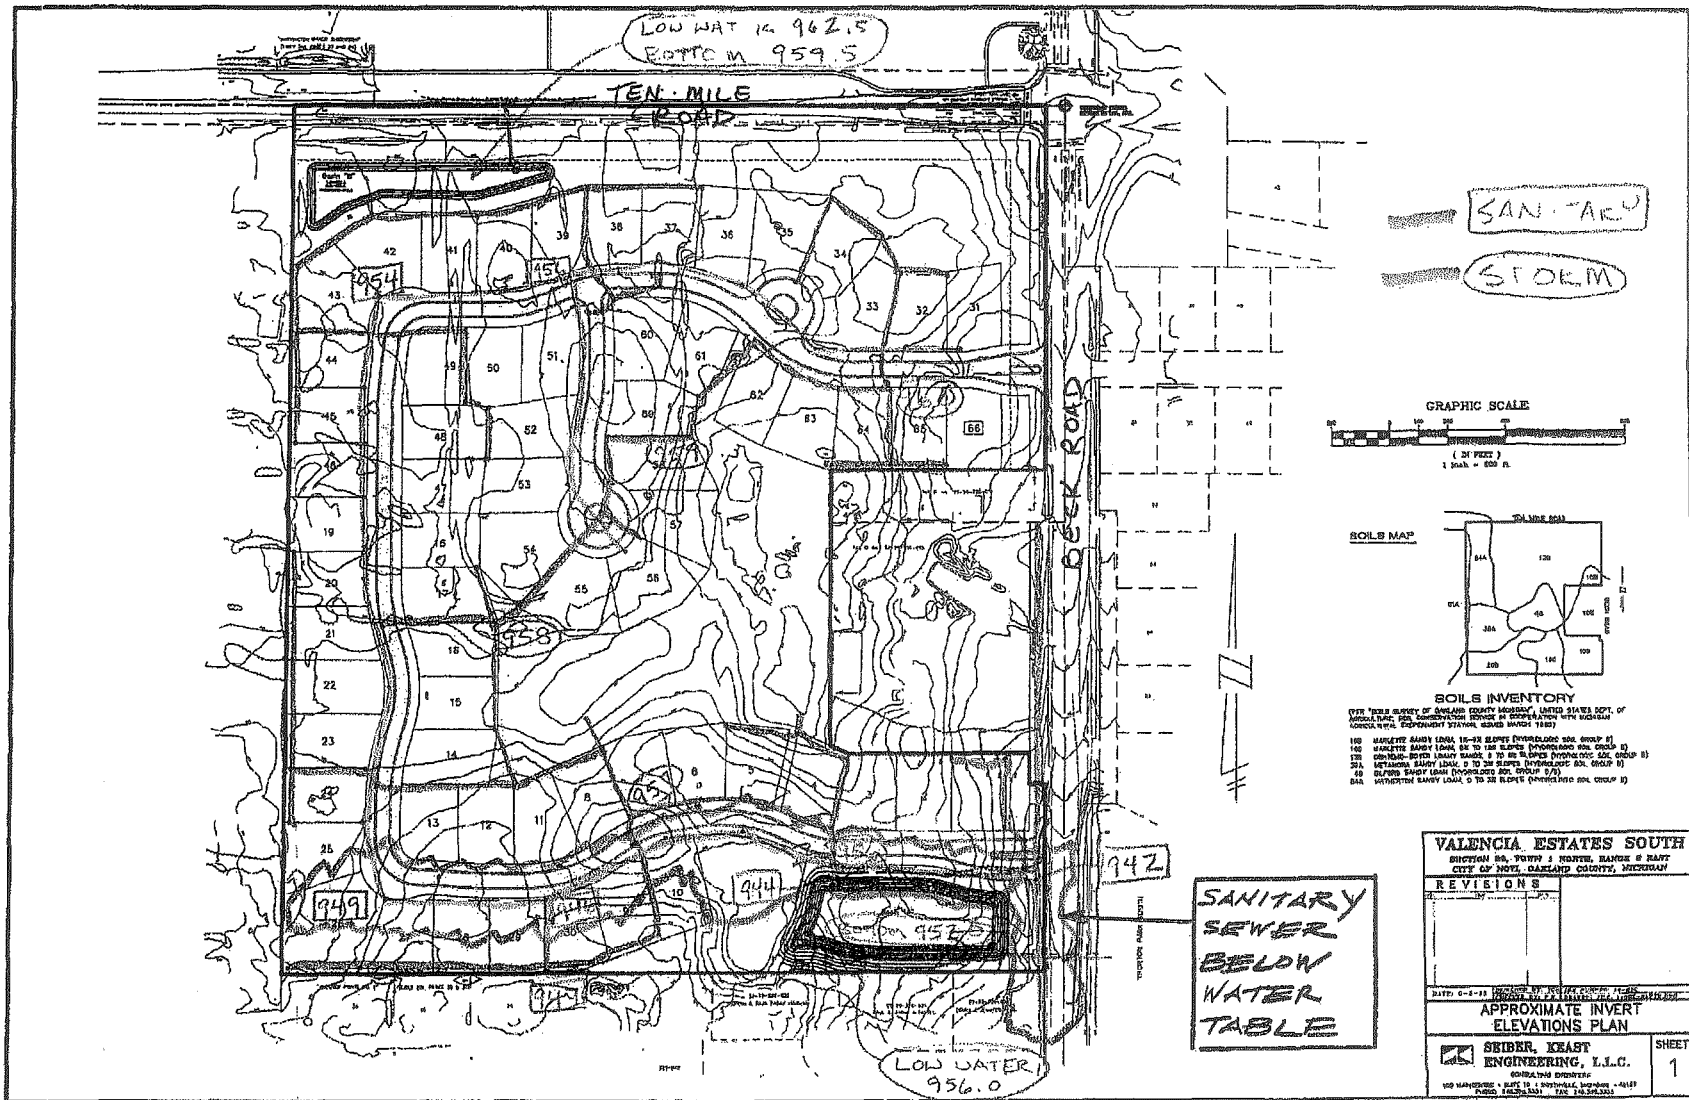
APPROX. INVERT ELEVATIONS PLAN
